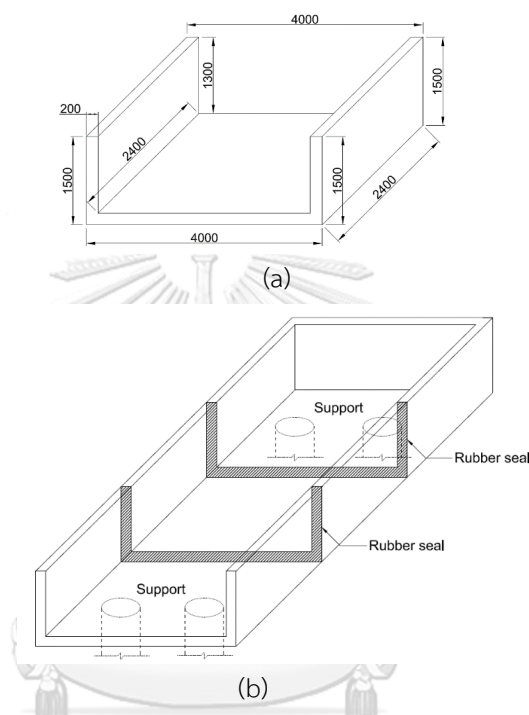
Prototype of a precast swimming pool; (a) Dimensions in mm of the precast concrete segment; (b) The connections of precast segments and rubber seal
